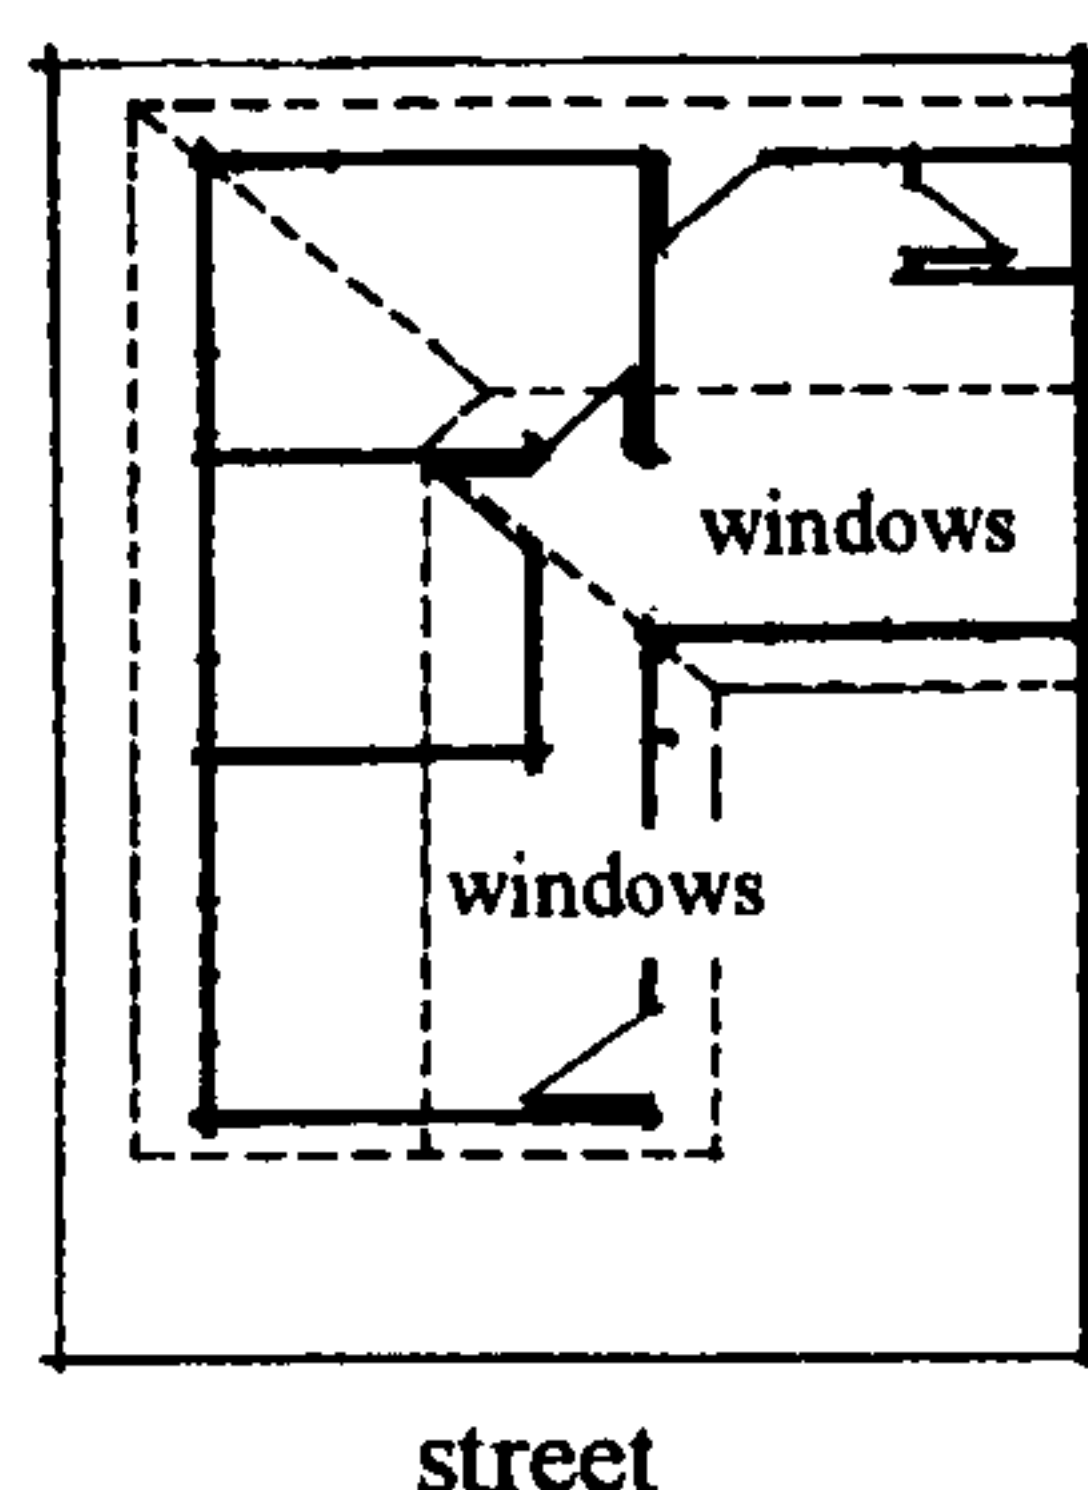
Design propositions for general room layouts (Plan of house type B)
